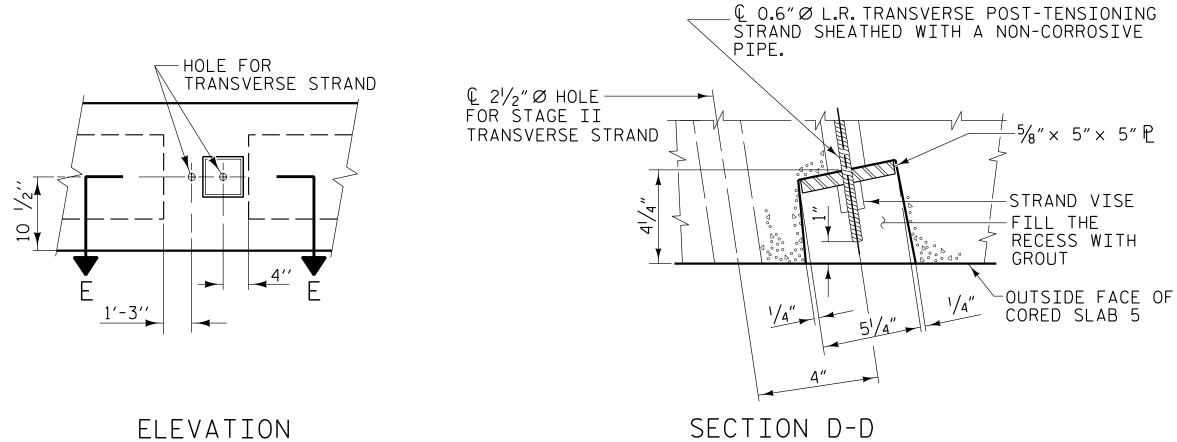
DETAIL A END OF POST-TENSIONED STRAND GROUTED RECESS
